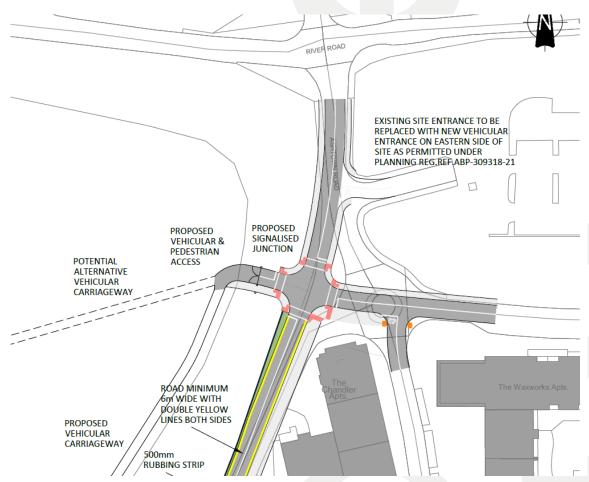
Extract from Waterman Moylan Sketch Design of Proposed Alternative Junction and Access to Ashton House
